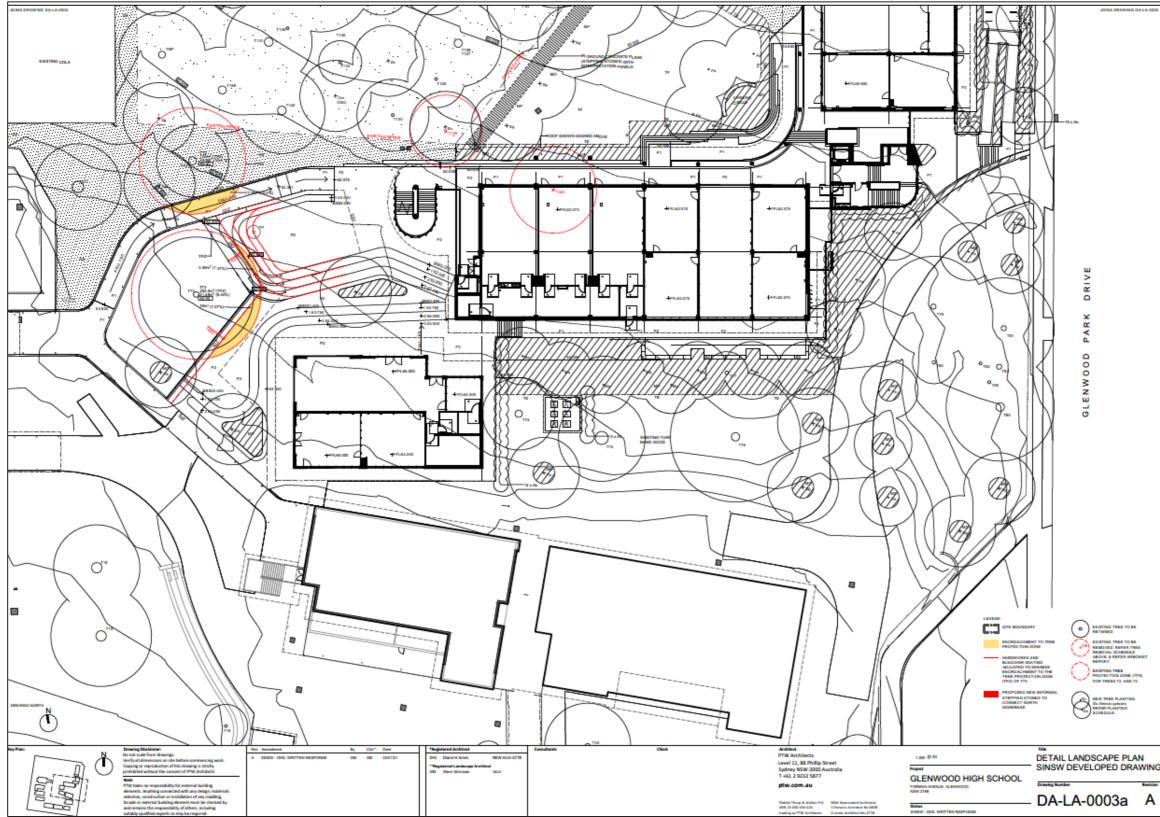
SSD/EIS – Landscape plan (PTW Architects 2021)
